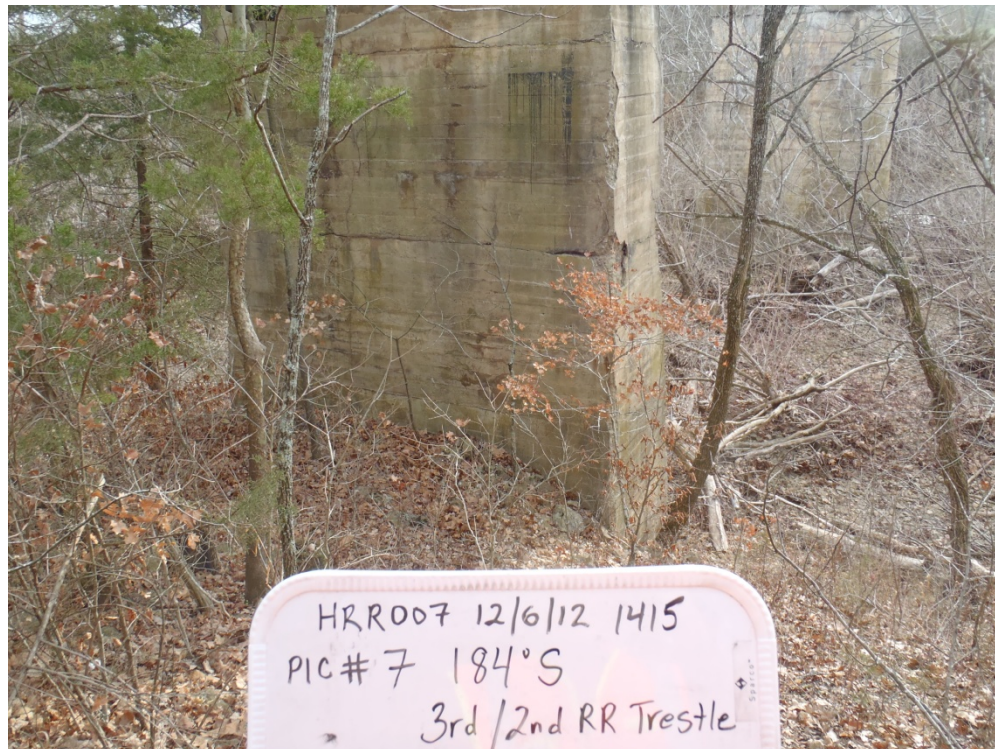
HRR007. Vegetated bank near former trestle crossing Big River
